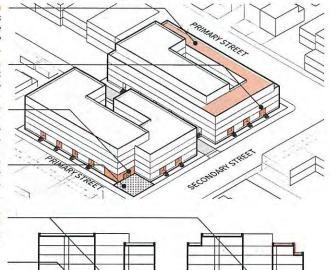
Mid-rise mixed-use development for small or medium sites - Typical mid-rise, mixed-use development on a medium site with an alley or internal circulation to provide access to the parking podium and allow for active residential frontages. Building stepbacks are provided near adjacent lower-density development.
